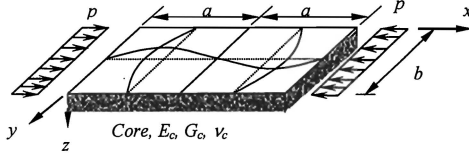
Steel Plate in Compression with Core as an Elastic Foundation
